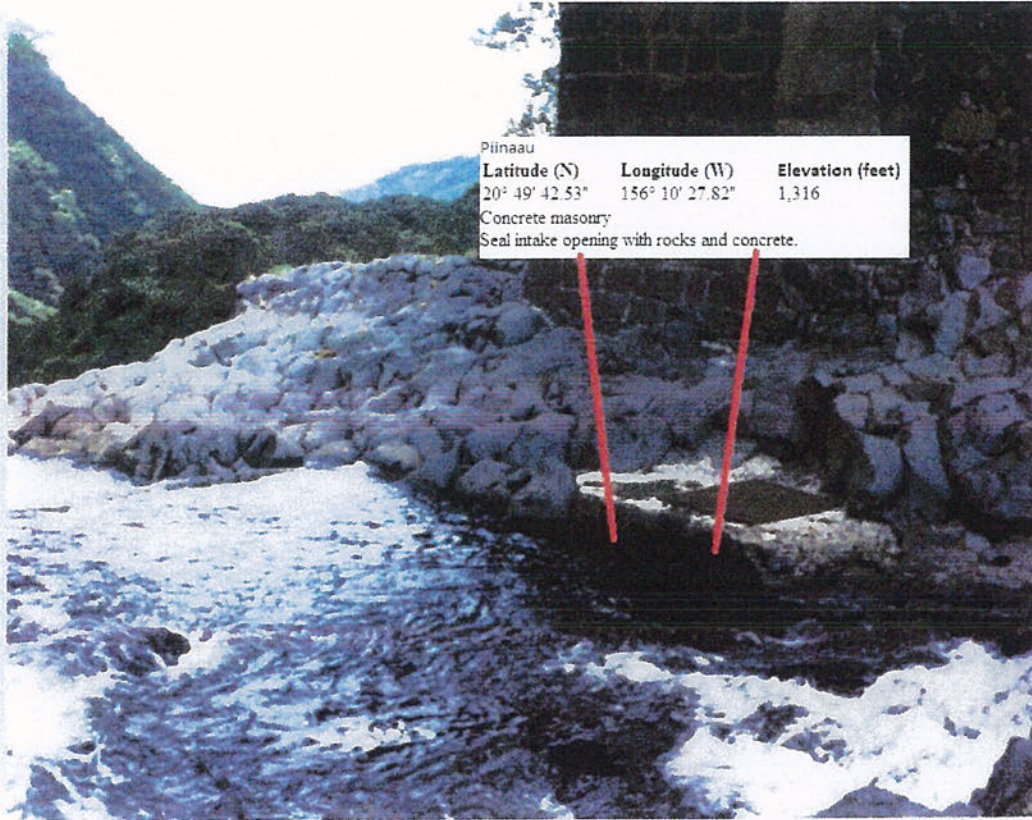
(above): Pi'ina'au at Koolau Ditch (K-31)
